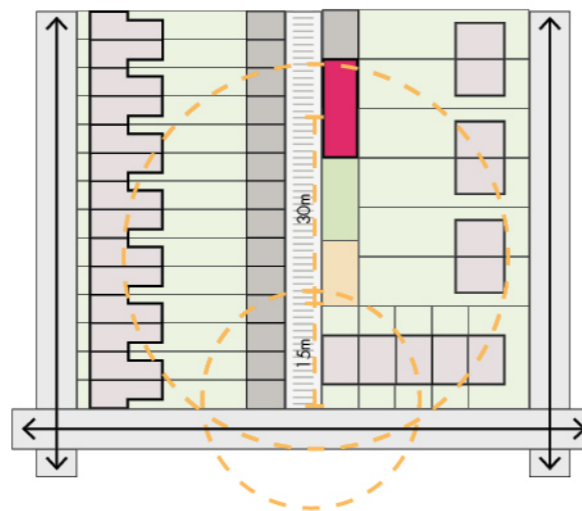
Plan diagram illustrating a backland site and the need for refuse storage within 15m of the highway and 30m from the dwelling.
